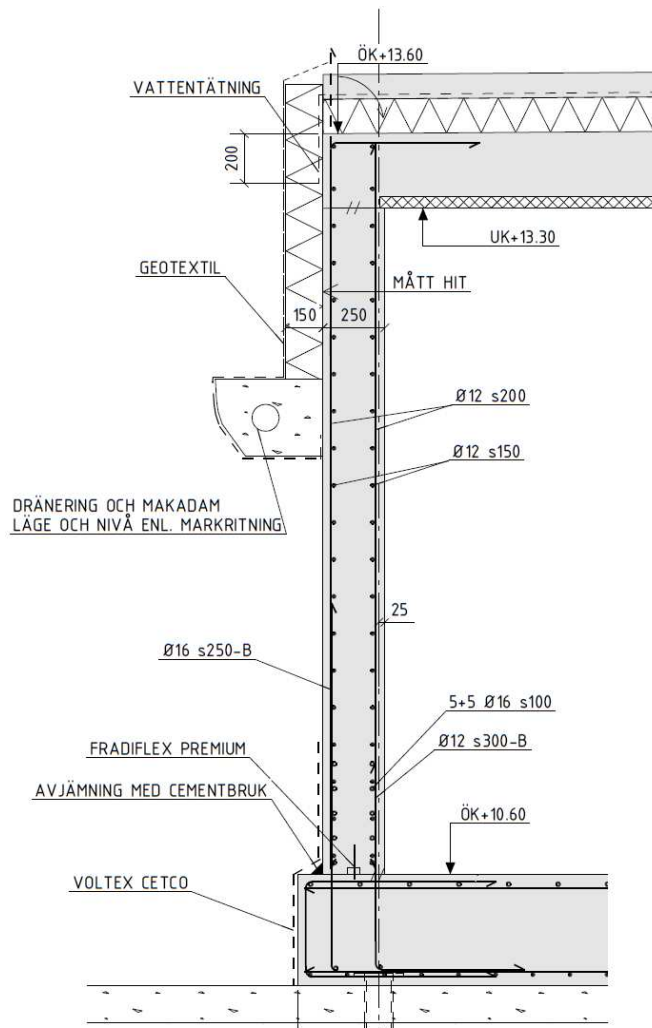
Detailing of wall 2 in object A [in Swedish], from building documentations
